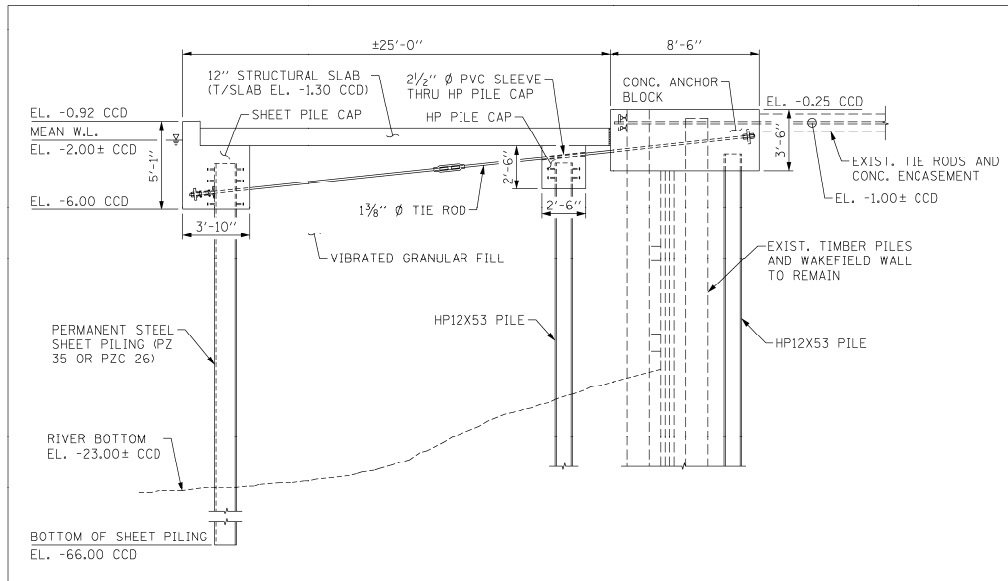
Section through Structural System in the Marina Plaza, Cove, River Theater, and Water Plaza
